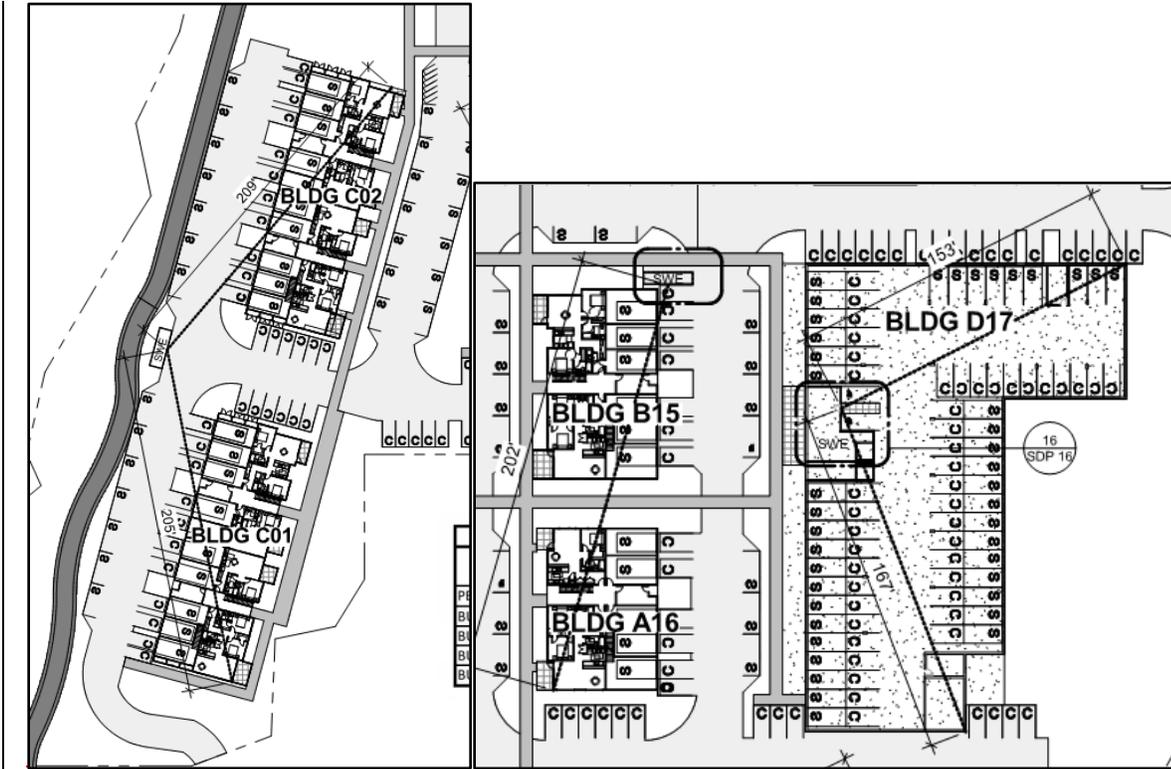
A, left, shows the location of the trash enclosure for buildings 1 and 2. Figure 30B, shows the location of the trash enclosures for buildings 15, 16 and 17.
